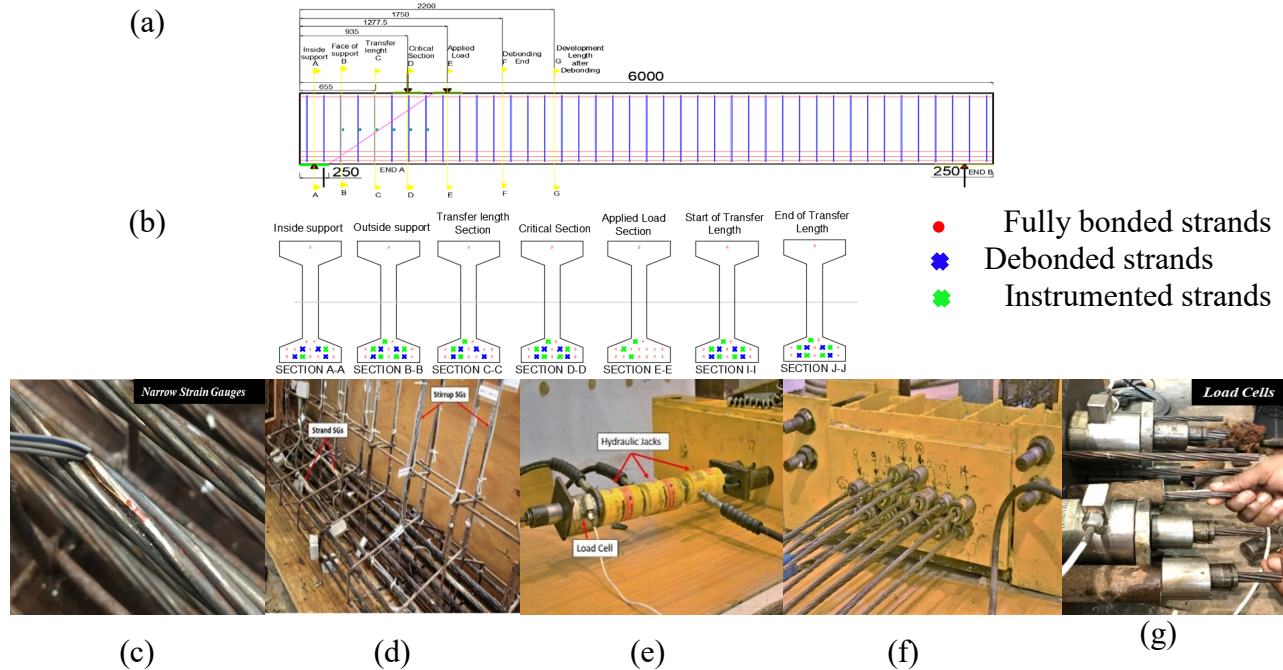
Details of the test specimen (a) sections in plan view; (b) detailed strand profile in each cross-section; (c) application of narrow strain gauge; (d) strand and transverse strain gauges; (e) hydraulic jack for prestressing; (f) locked strands; (g) load cell to monitor applied prestress
